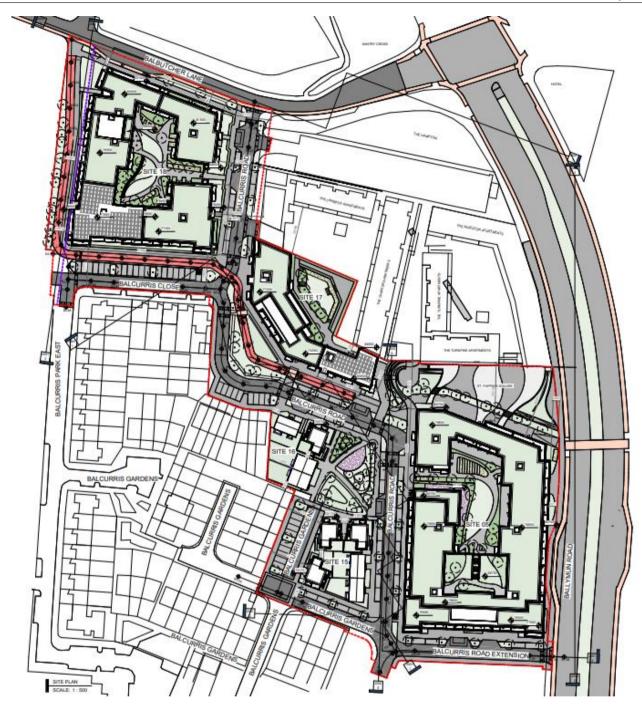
Proposed Development – Site Layout Plan (Source: MCORM Architects)
